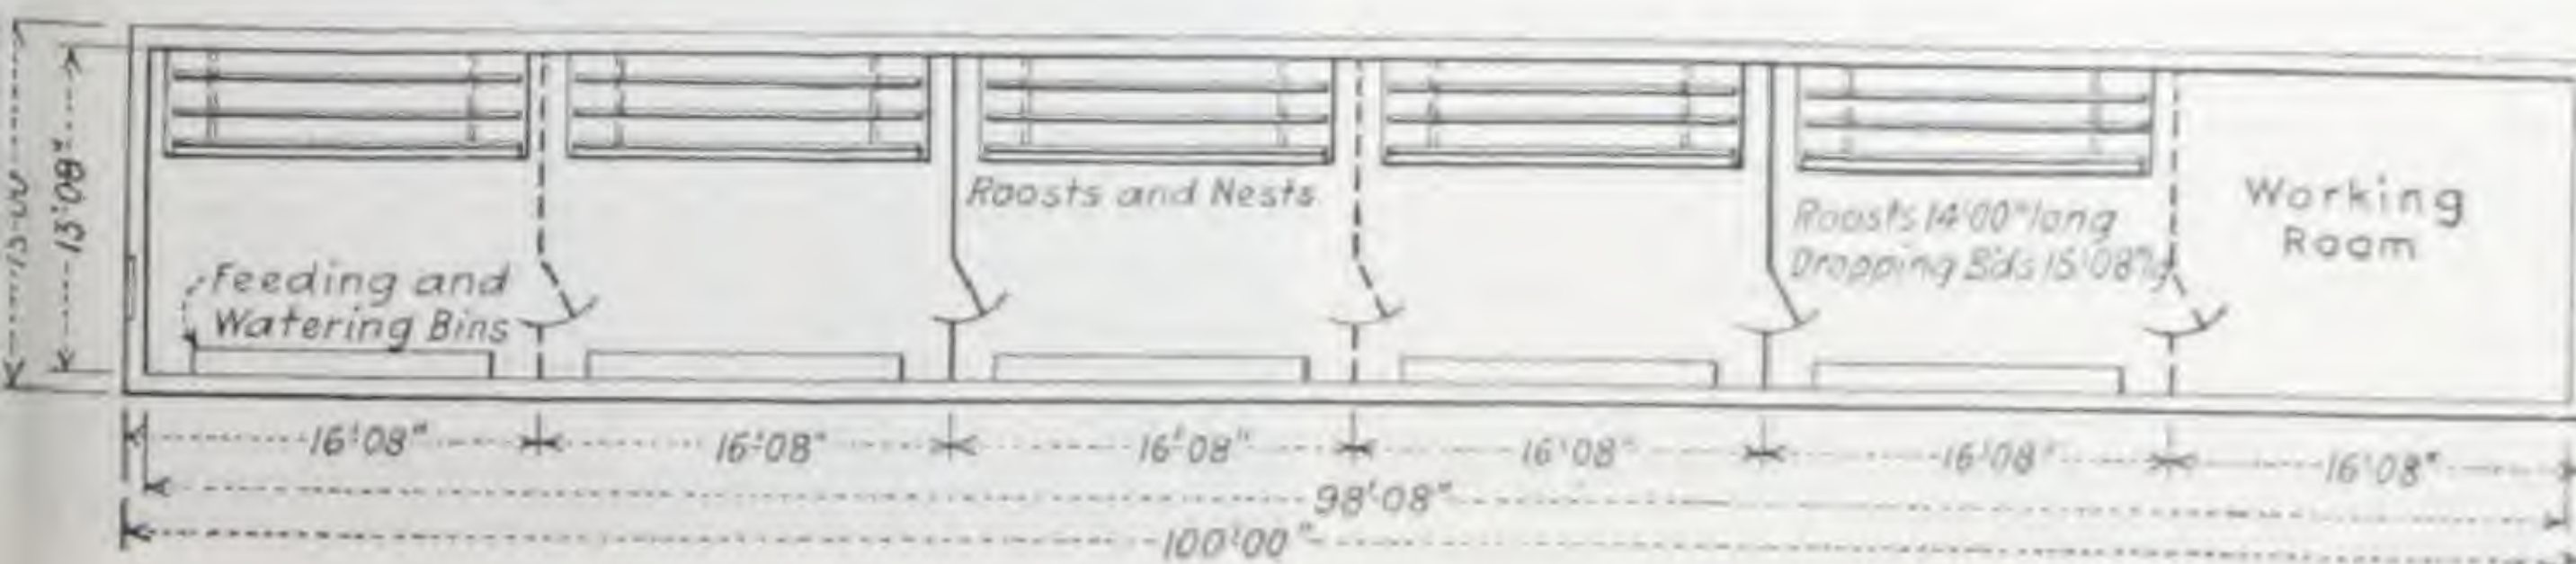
Floor plan for chicken house with five rooms for fowls and a work room.
